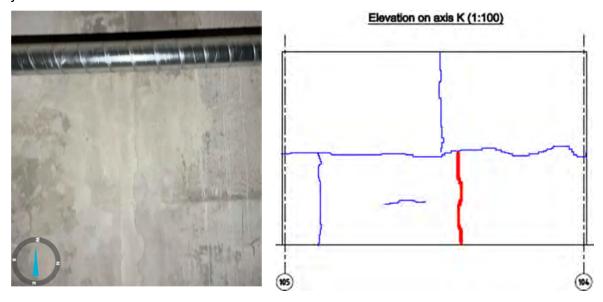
Cracks on the wall of Interim storage (existing crack red marked, repaired cracks blue marked)
